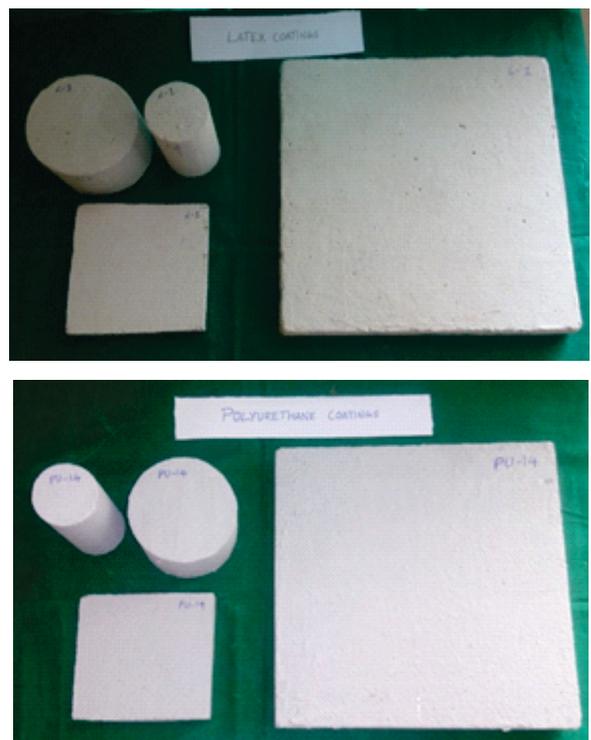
Test Specimens with Latex coating and Polyurethane Coating
